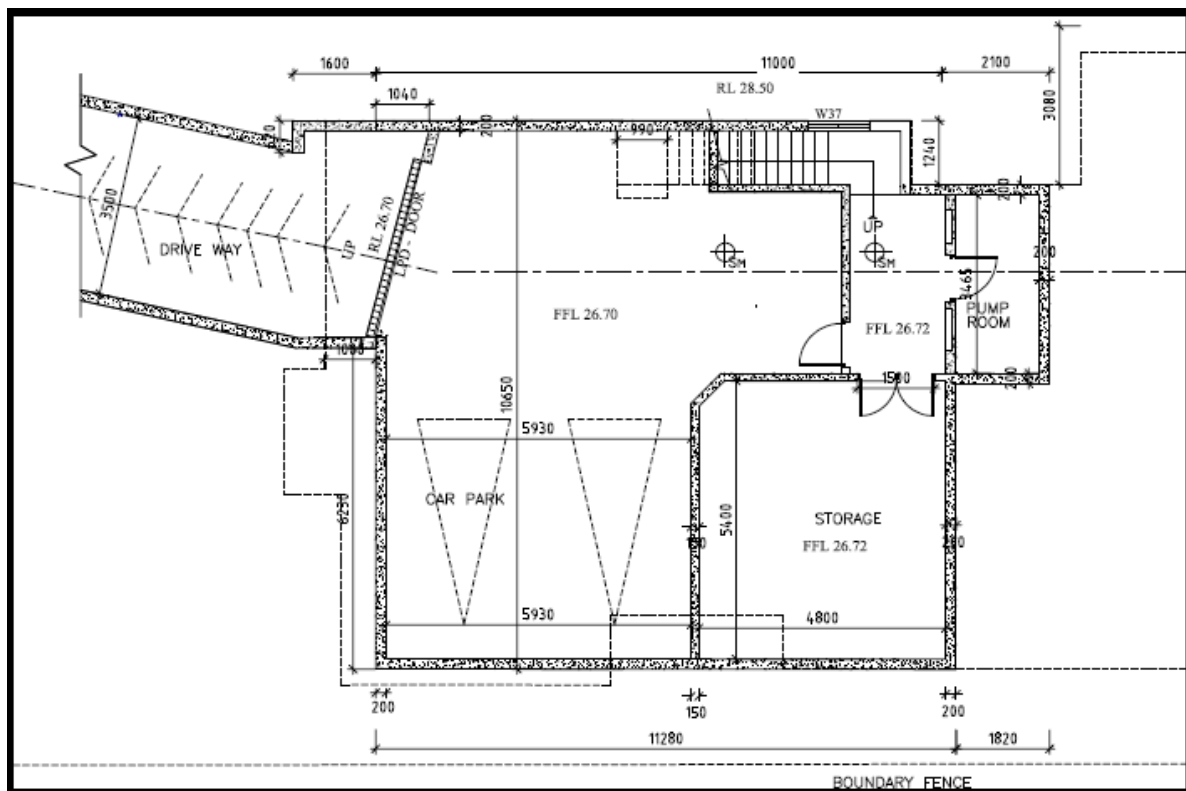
Approved DA 2019/33 basement plan (deleted in DA 2019/33/2)
